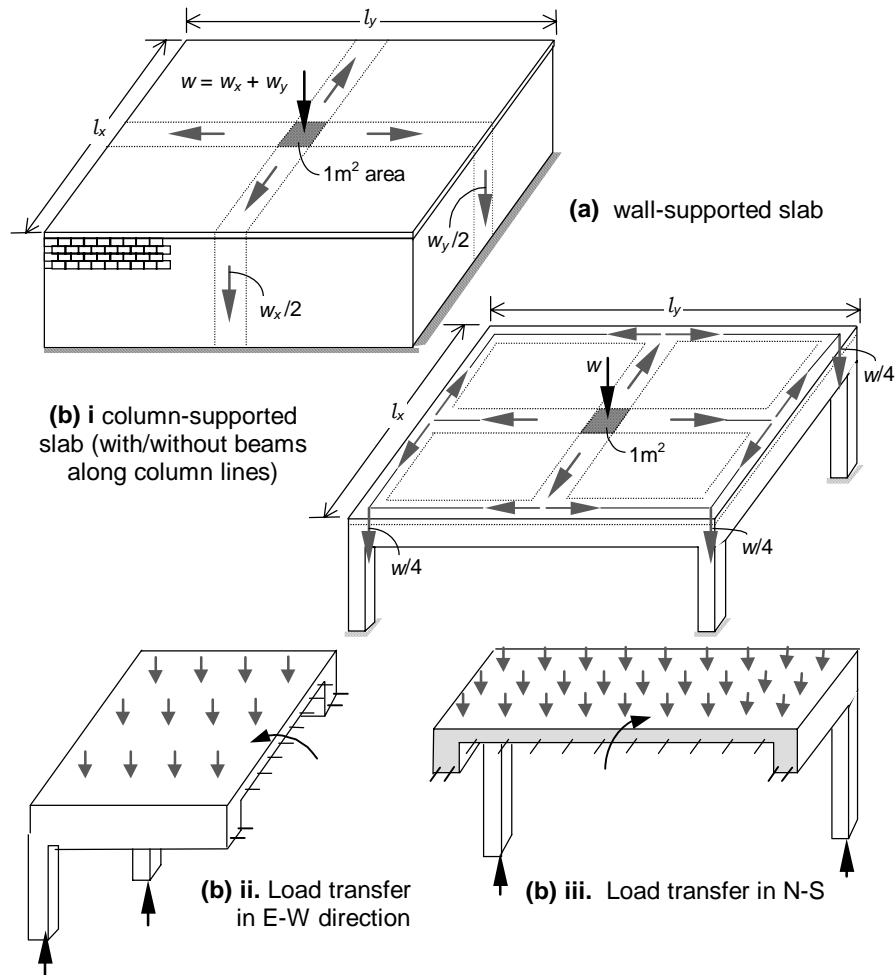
Load transfer in wall-supported and column-supported slabs
